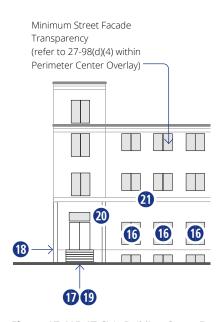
Civic Building: Street Facade Design Requirements
